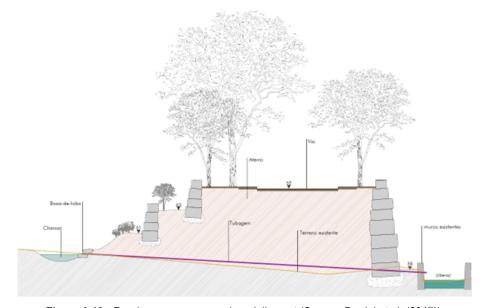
Road access - proposed modeling cut (Source: Pardal et al. (2017))
